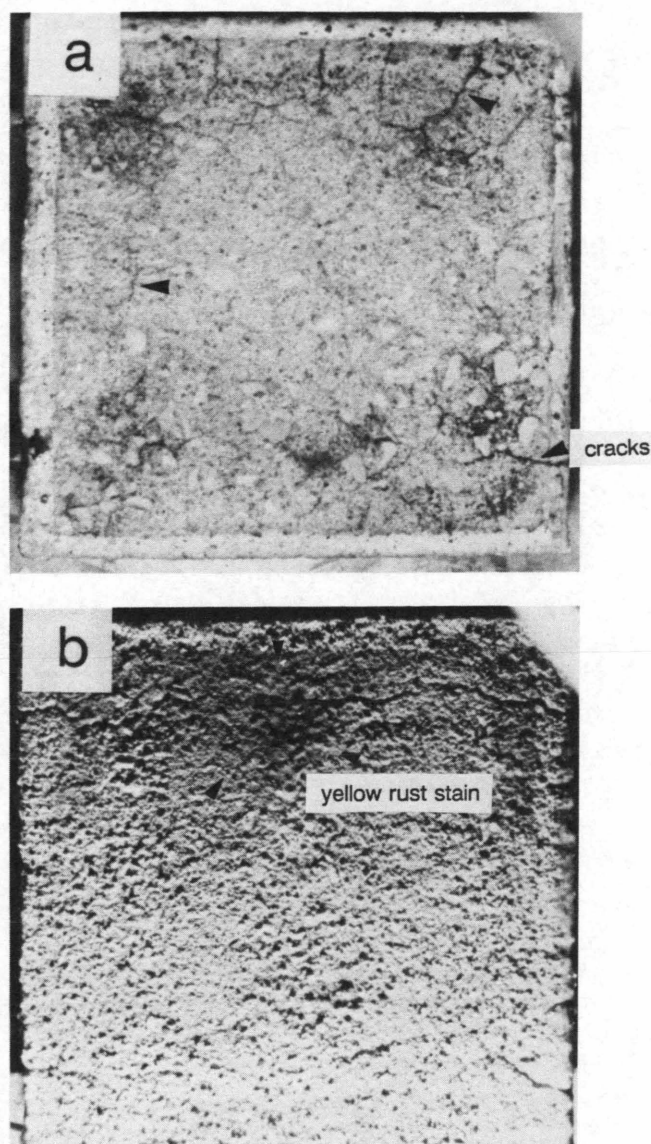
Top surfaces of concrete slabs showing (a) numerous concrete cracks and (b) yellow rust stain.
